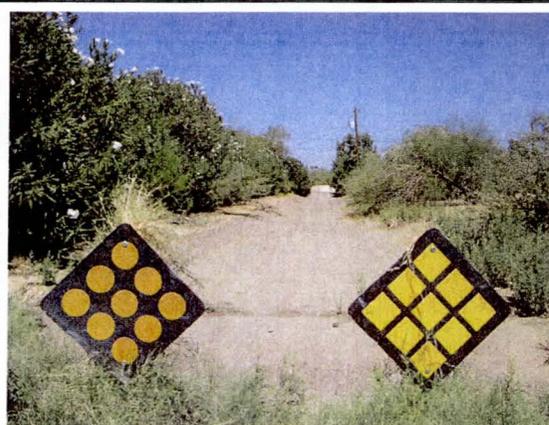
Asphalt swale between Sunnyside & Jenan Dr (Facing north)
